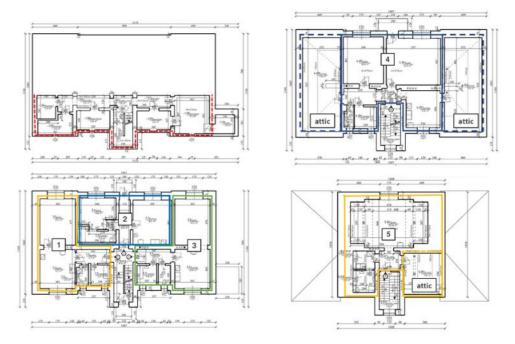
Polish demo. Plants. Semi-basement and Ground Floor on the left side. First and second floor on the right side
